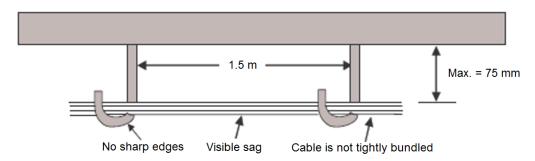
Hanging pathways for coaxial cables running above false ceilings
